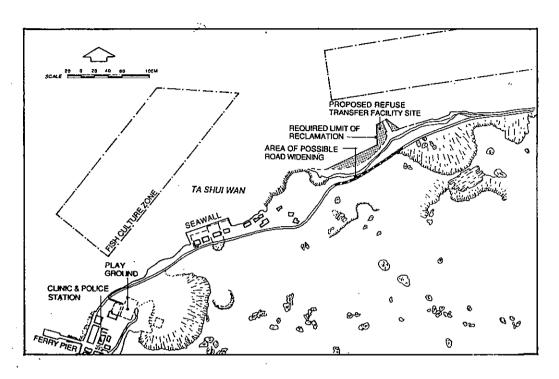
SOK KWU WAN TRANSFER FACILITY LOCATION PLAN (ORIGINAL LOCATION)
